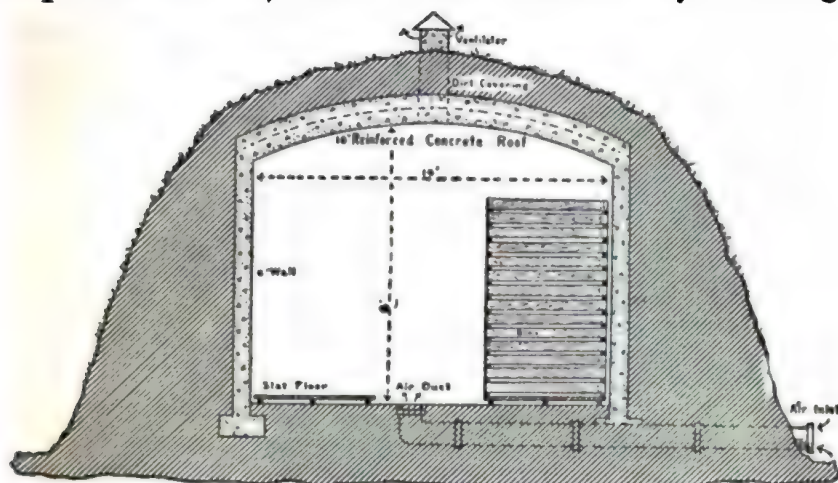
Cross section of a concrete storage cellar, showing the arrangement of ventilators, slat floors, and bins, with provision for the circulation of air under and around the slat floors and bins. This cellar is ten feet wide and eight feet high, inside measurement.—U. S. Dept. of Agriculture.
